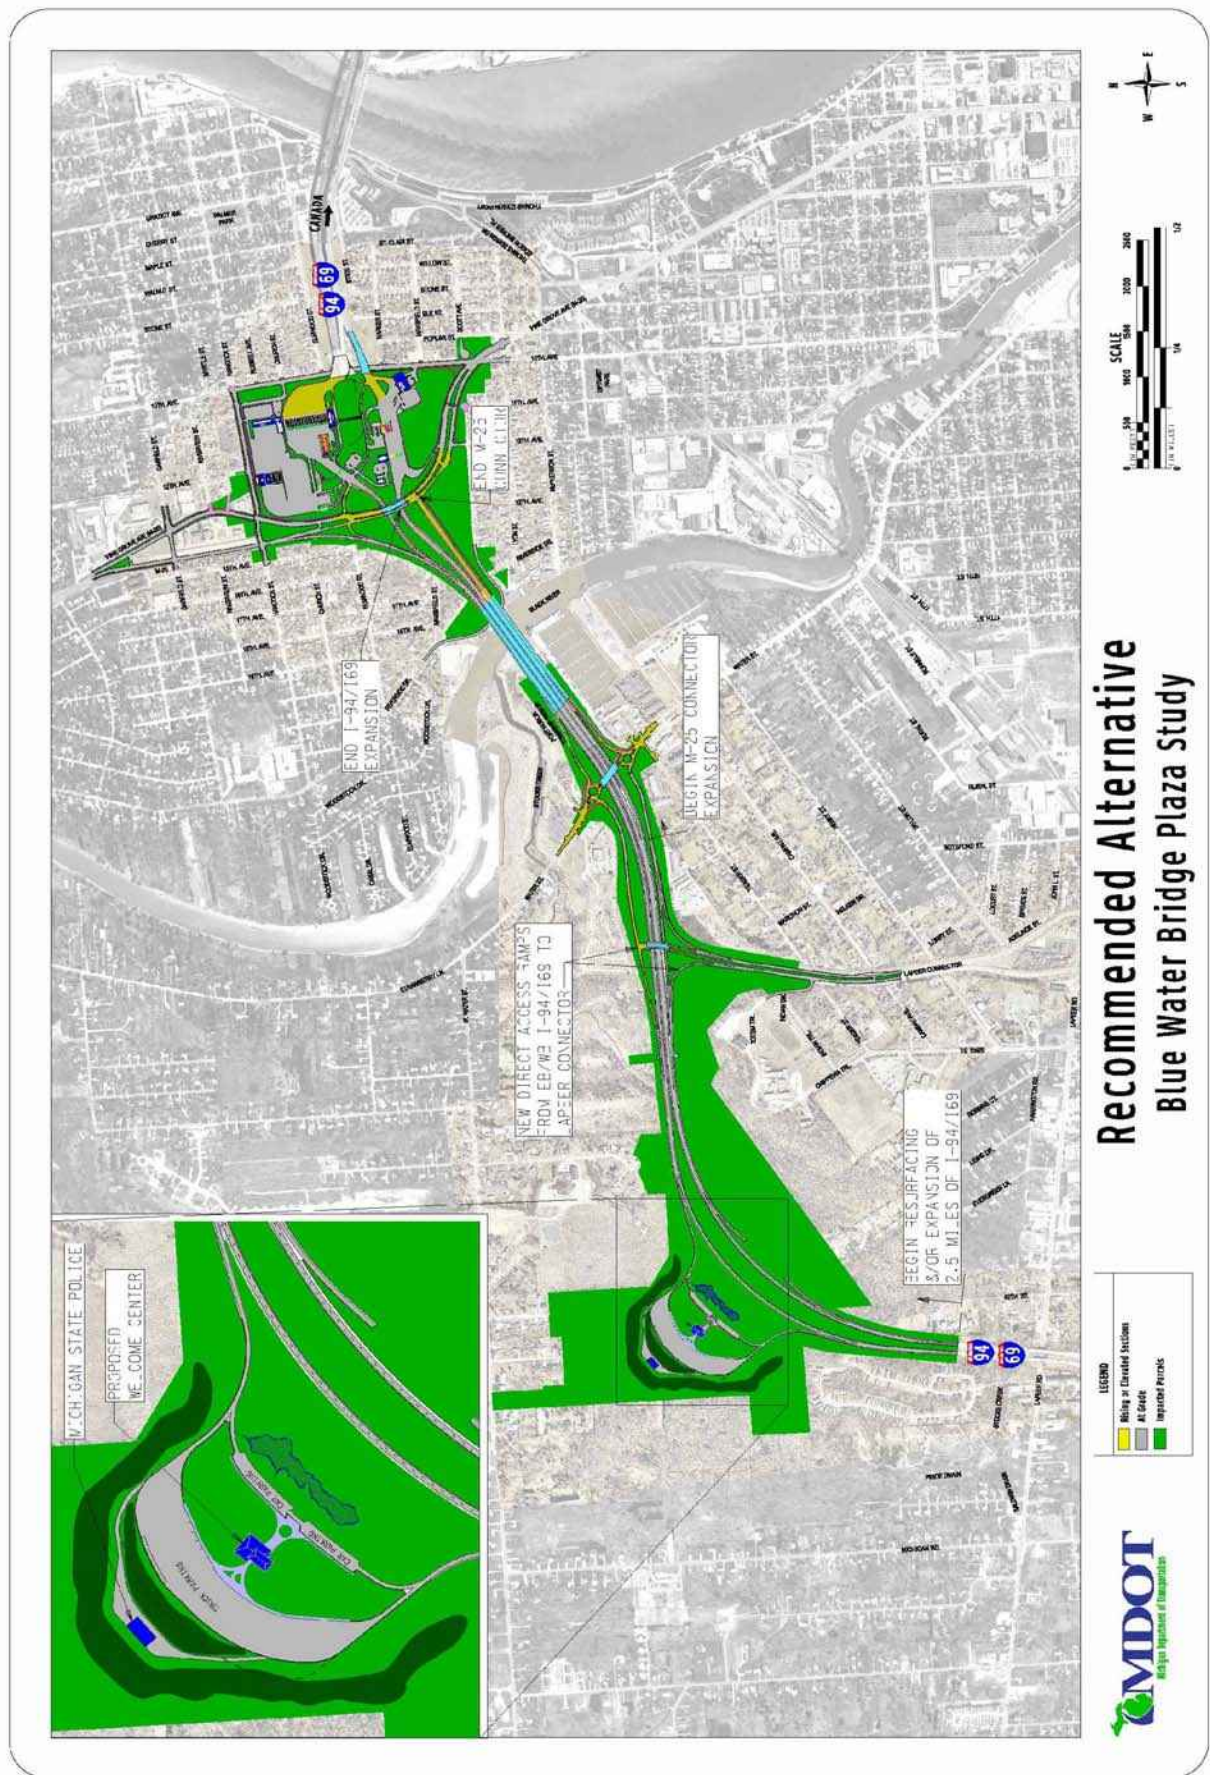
Recommended Alternative and I-94/I-69 corridor
